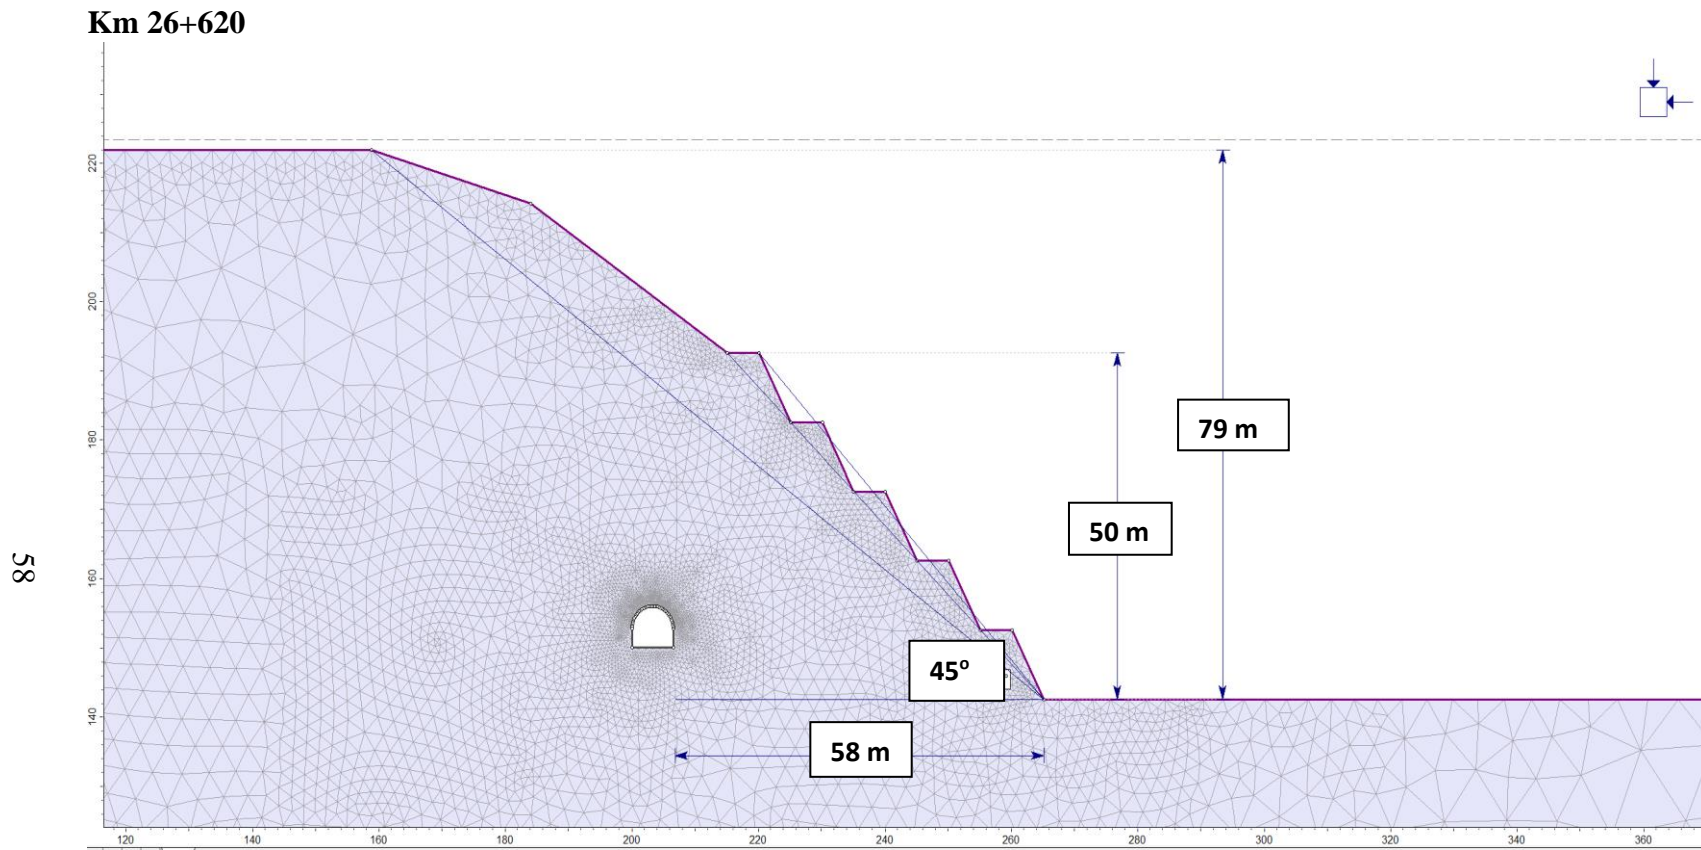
Slope dimensions and finite element model of the planned slope profile, section A-A', Km 26+620
